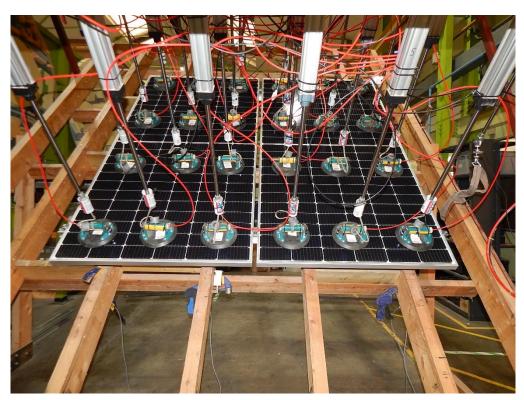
Installation of the RH Flat Roof Hook system on the BRE test rig prior to test.
